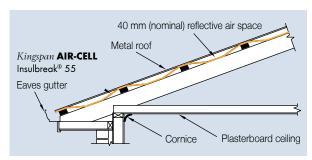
Side elevation of Kingspan AIR-CELL Insulbreak® 55 in a metal roof with an attic space and flat ceiling
